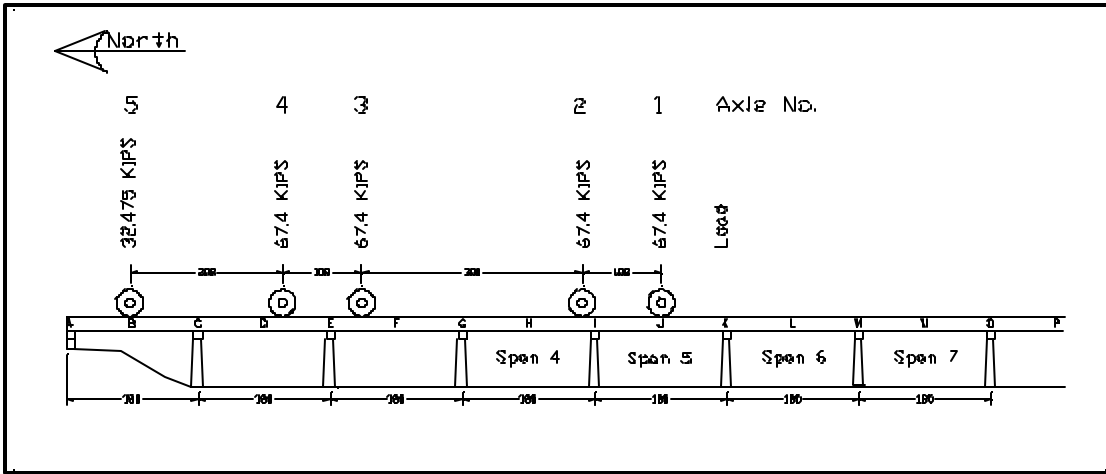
Loads applied to Bridge 32.35 due to load position 1@J. Dimensions are in inches.
